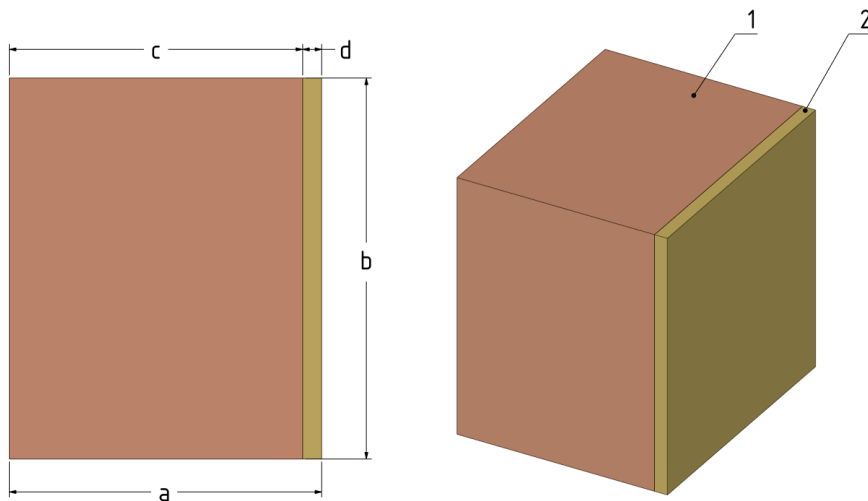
General view of a 3D model of a wall with plastering (option 3): thickness (a); height (b); bearing layer (c); insulation layer (d); bearing layer material (1) — masonry; plaster layer material (2) — heat-insulating gypsum concrete (type 3)
